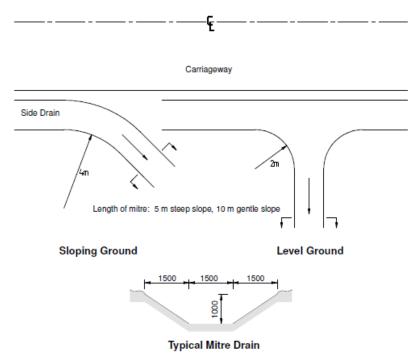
2 Typical Stormwater Mitre Drain / Channel
